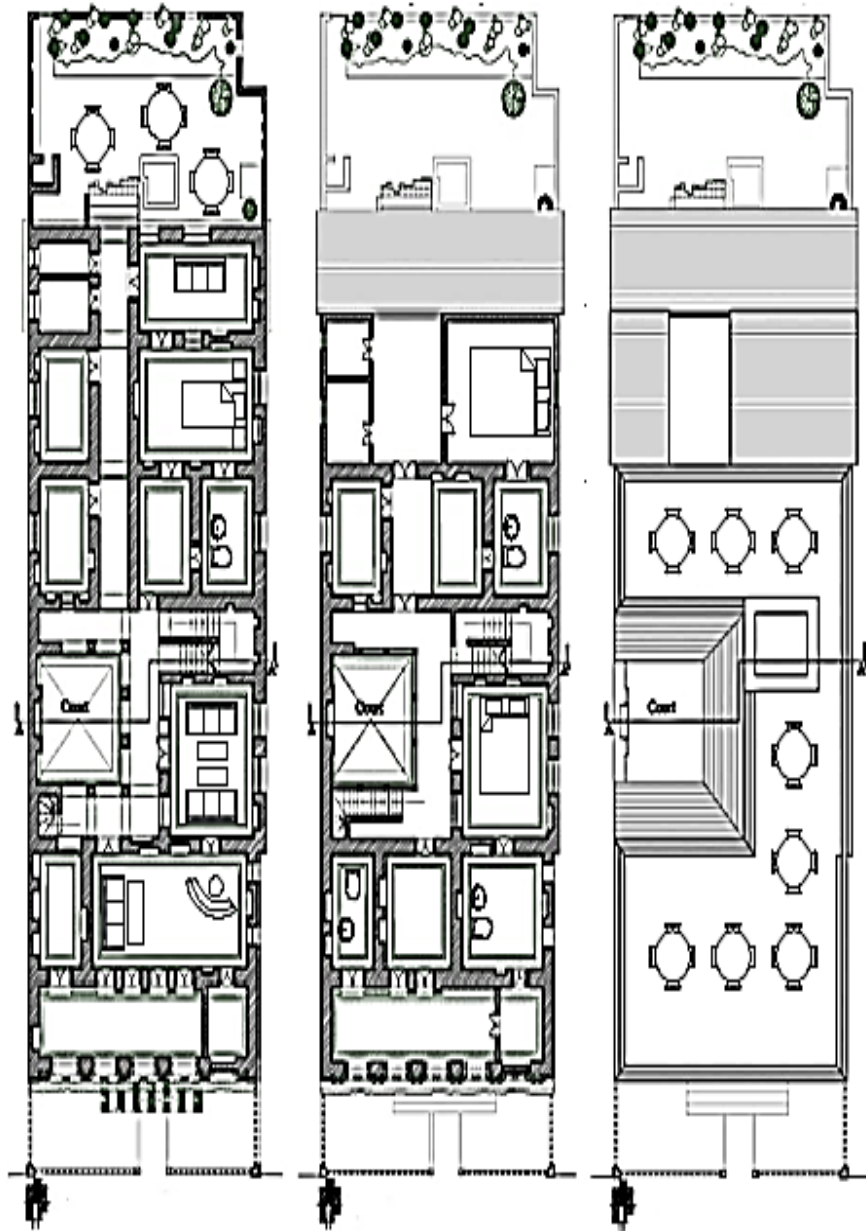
Ground floor plan, first-floor plan, roof plan (from left to right)
